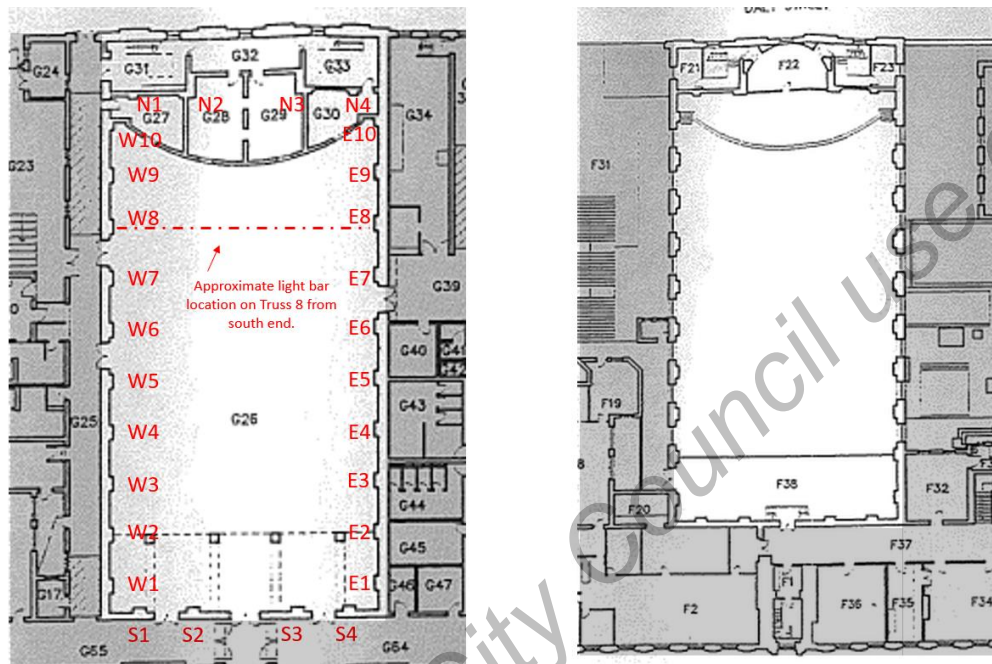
Main Hall plan arrangement (Ground floor – left; First floor – right).
